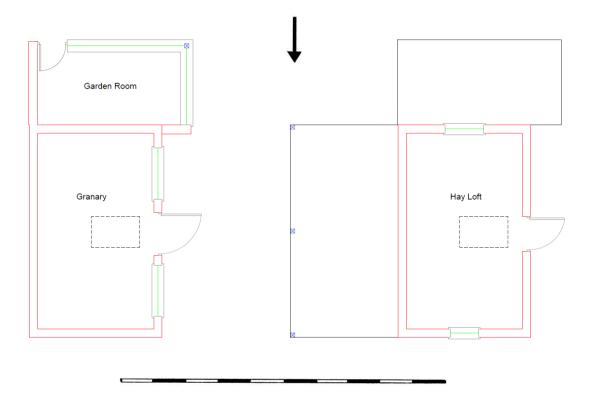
Ground (left) and first-floor plans by Oswick Ltd. Scale in metres. The 'hay loft' was in fact a grain store.
